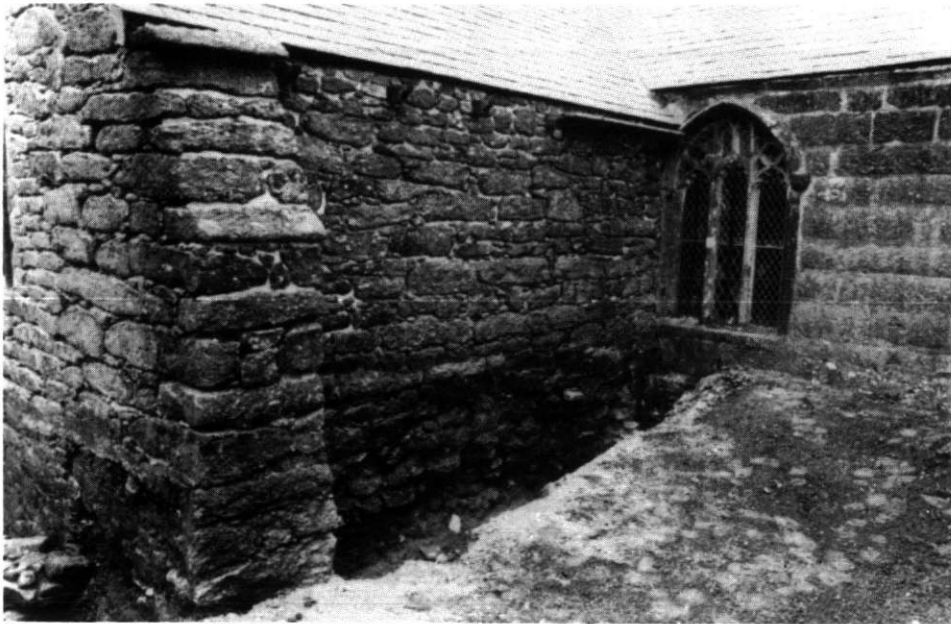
Buttressed west wall of the north transept, showing the loose rubble foundation exposed in a drainage trench. (Photo: Warwick Rodwell)
